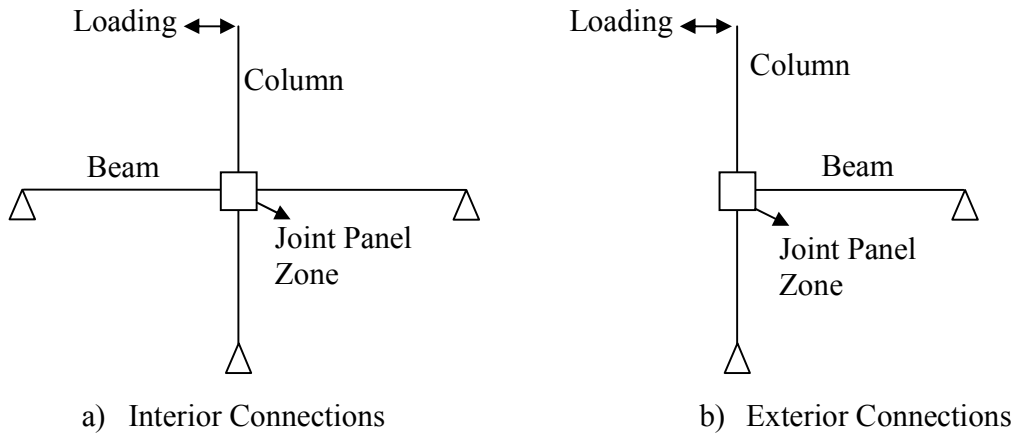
Specimen Models when the Loading is Applied at the Top of the Column
